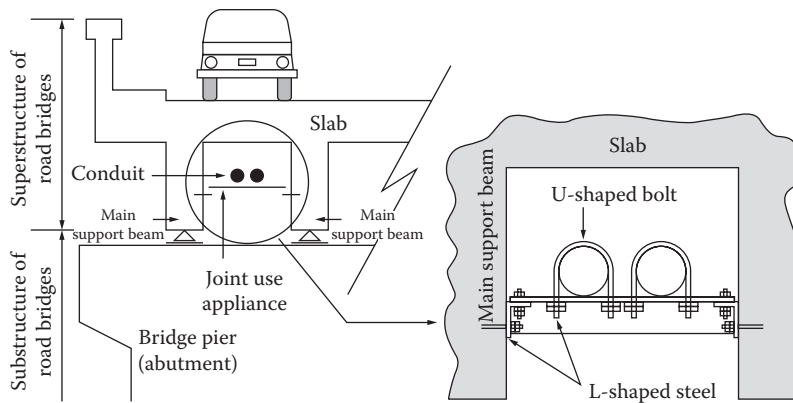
Overview of joint use of a bridge's superstructure.
